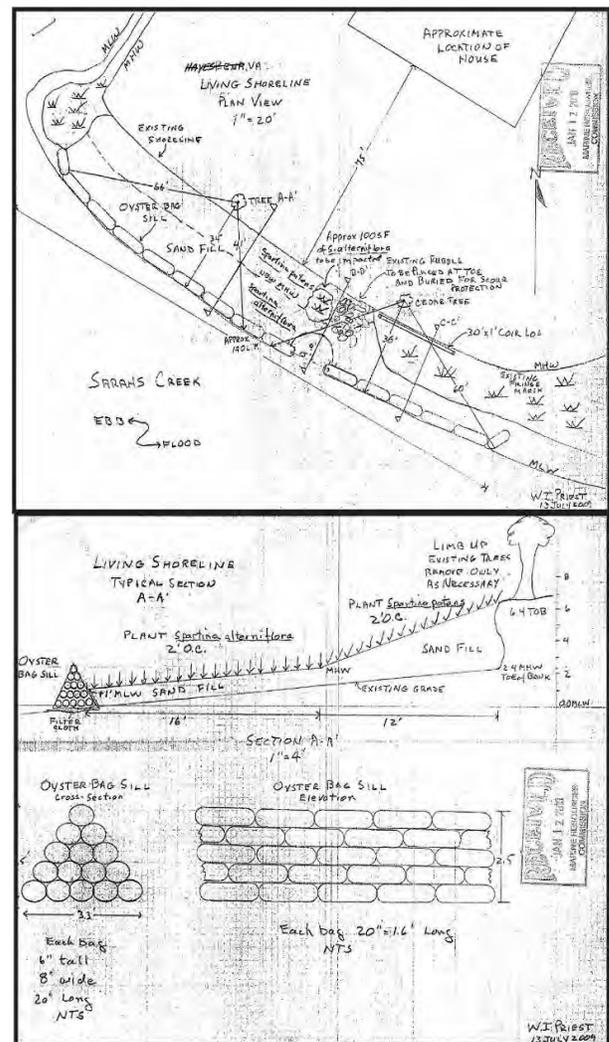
Site 1 oyster bag sill planform and cross-section from the permit application.
